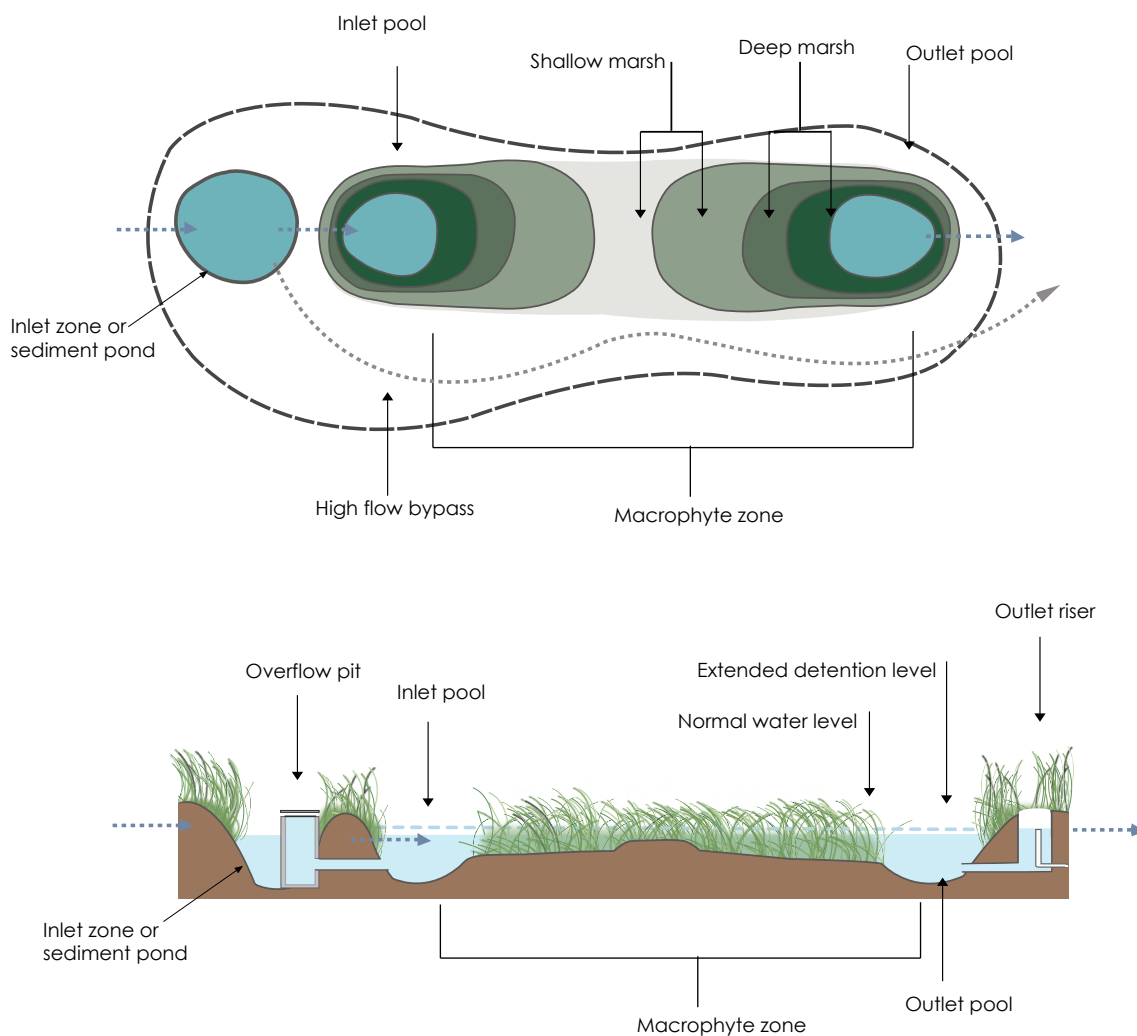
Typical cross-section and plan of a constructed wetland.
